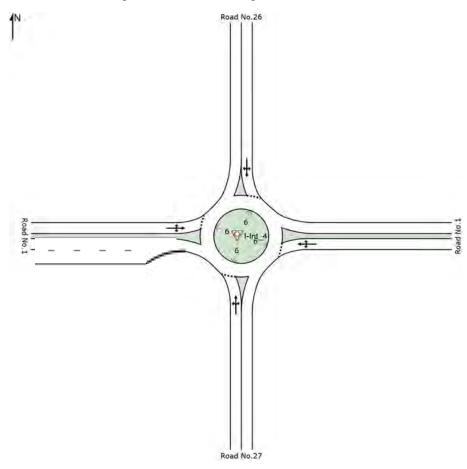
Road No 1, Road No 26 and Road No 27 Proposed Intersection Layout Table 3 – Road No 1, Road No 26 and Road No 27 Intersection Performance Summary
